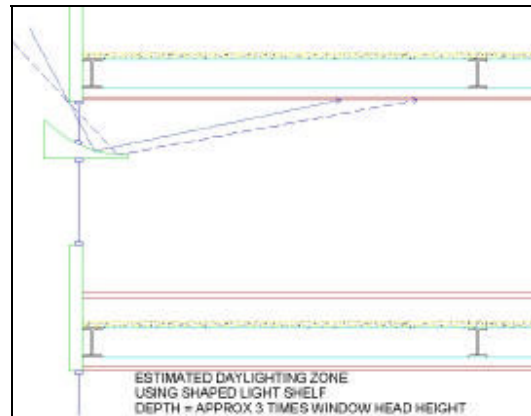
Floor-to-floor section of a proposed articulated glazing system and light shelf.
